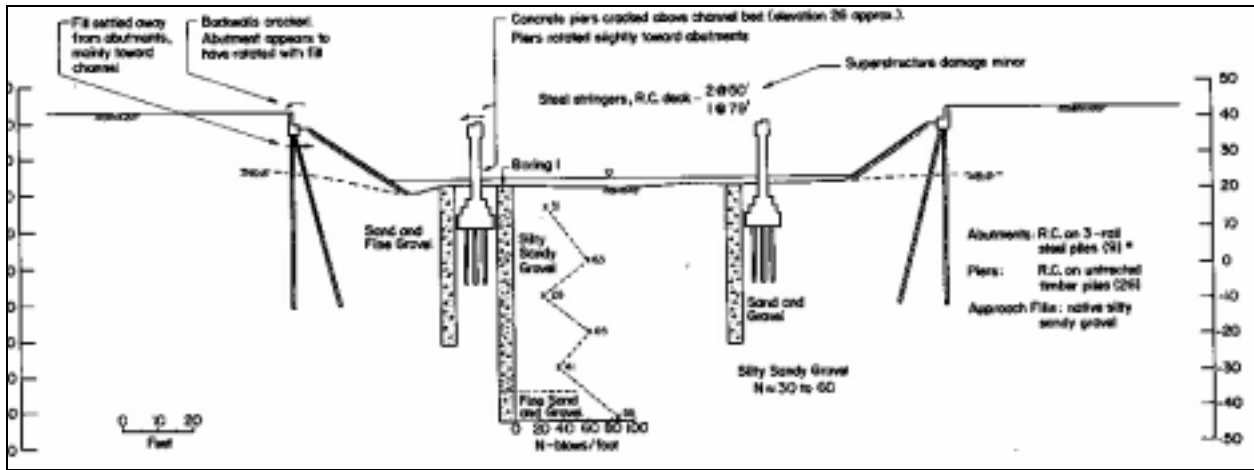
Bridge 598, Resurrection River. Centerline Section Looking Upstream (Natural Scale)
